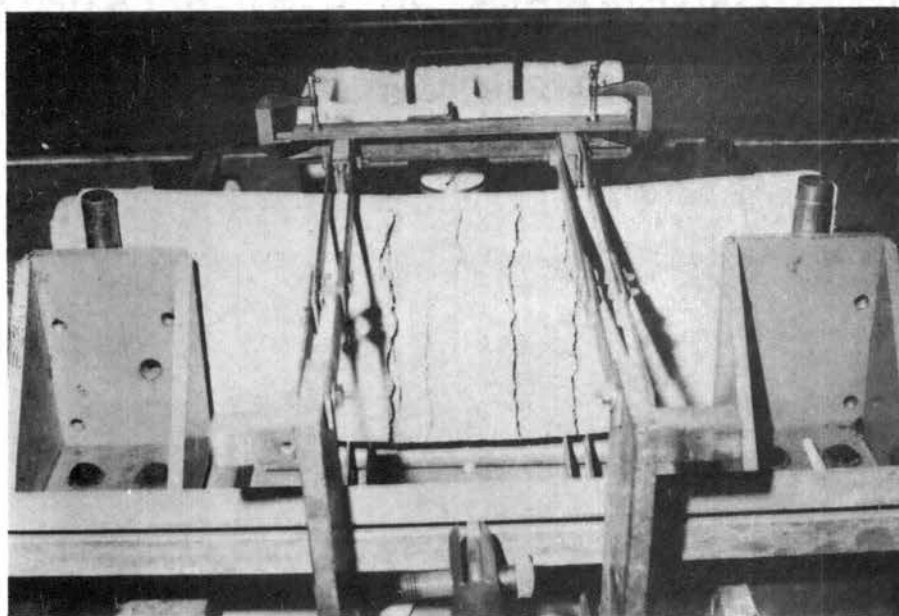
Front View of Panel 14-1 Prior to Failure Showing Crack Development and Crack Spacing.
